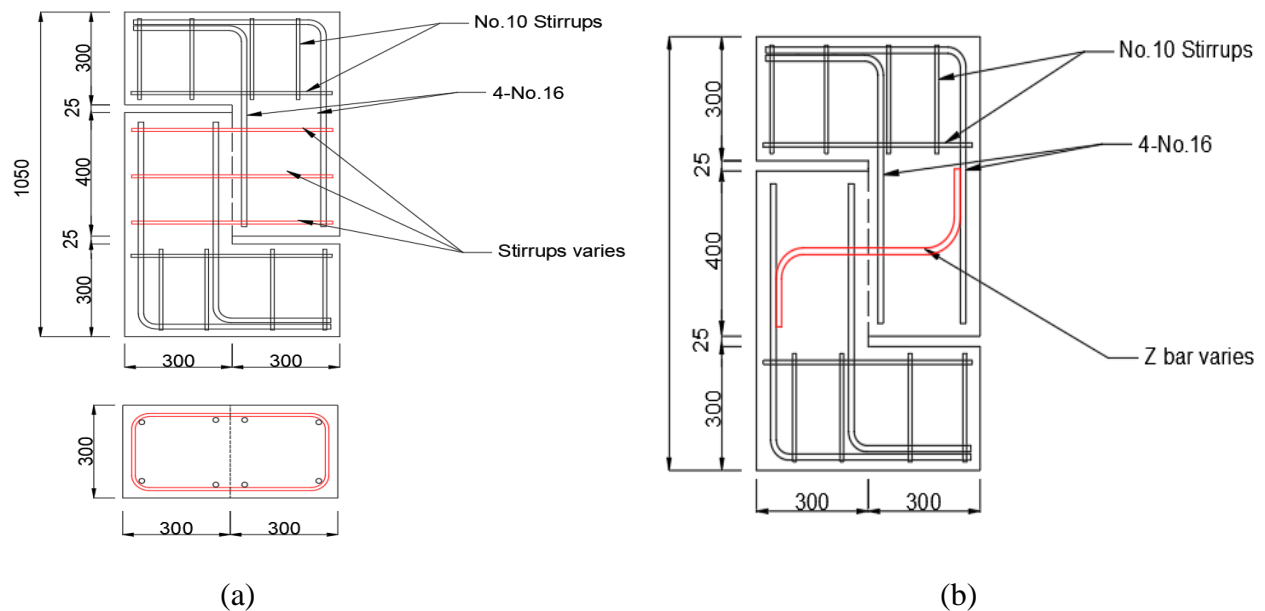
Specimens design, (a) closed stirrups, and (b) Z-shaped bars
